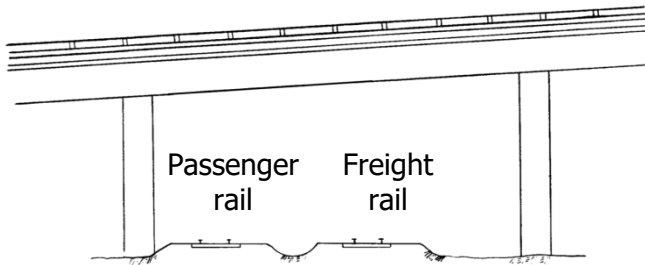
Bridge elevation view with one passenger rail and one freight rail track below the bridge.
